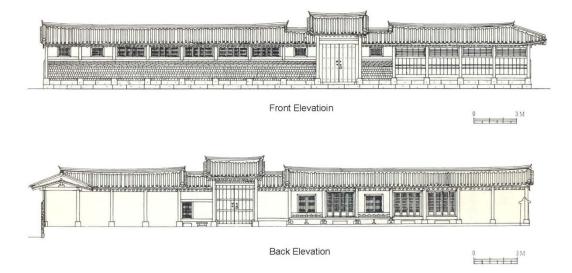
Haengnangchae Elevation (N. Zu 2003)
